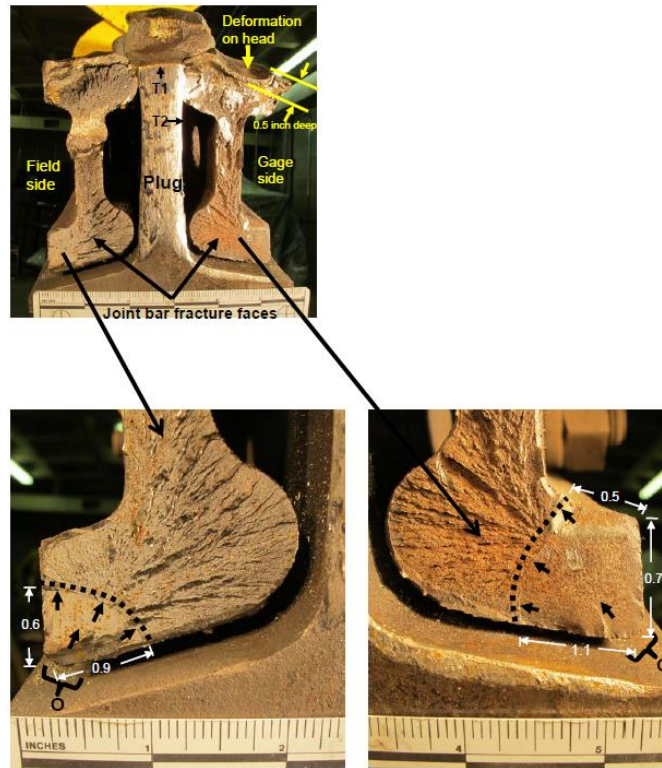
Photograph of an exemplar compromise joint bar denoted by arrows (not Metro-North).
